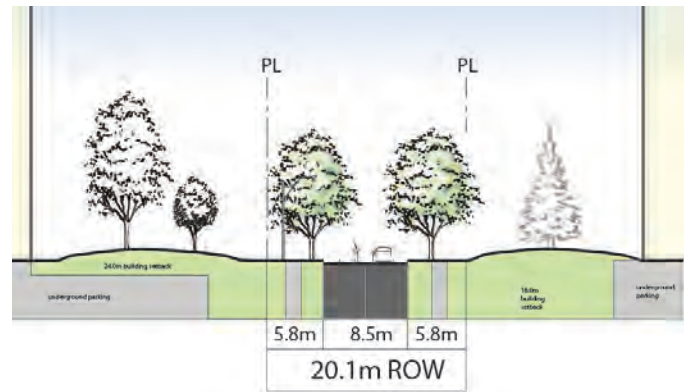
Pacific Avenue, illustrative street cross-section diagram.
